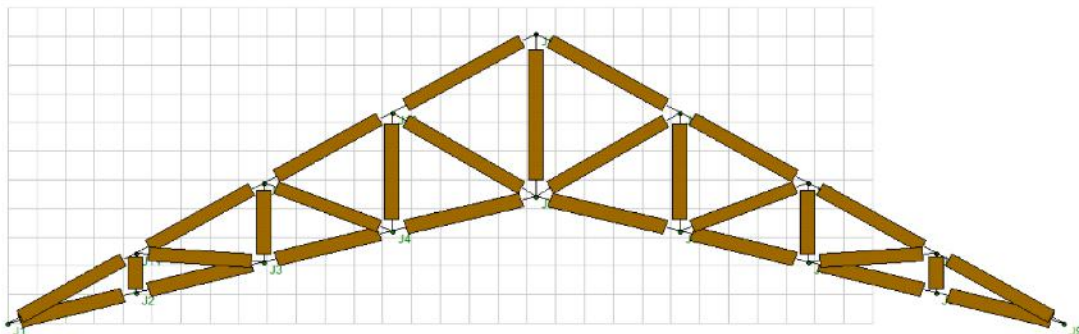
Roof Truss Version 2 RISA-3D Generated.
